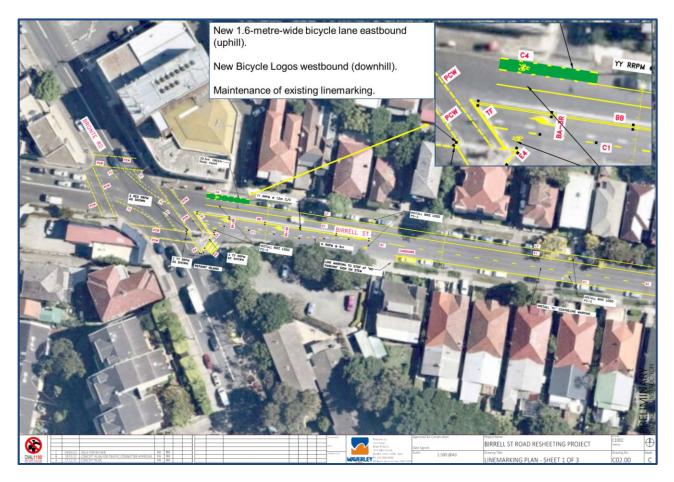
Line marking plan along Birrell Street east of Bronte Road.
